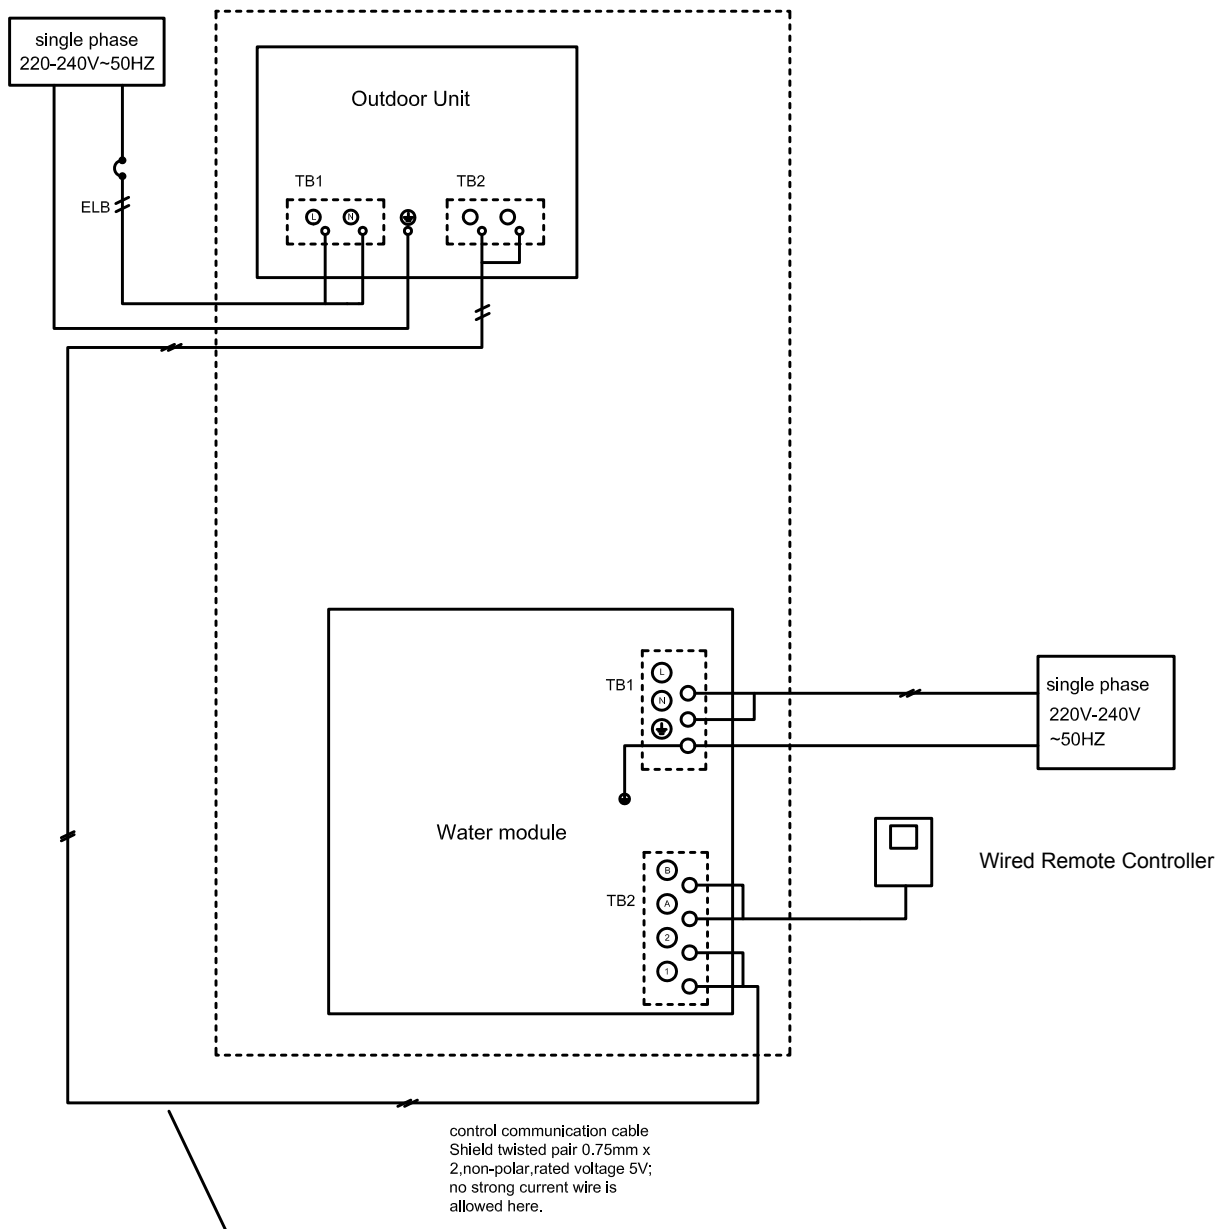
Wiring Connection for Indoor & Outdoor
